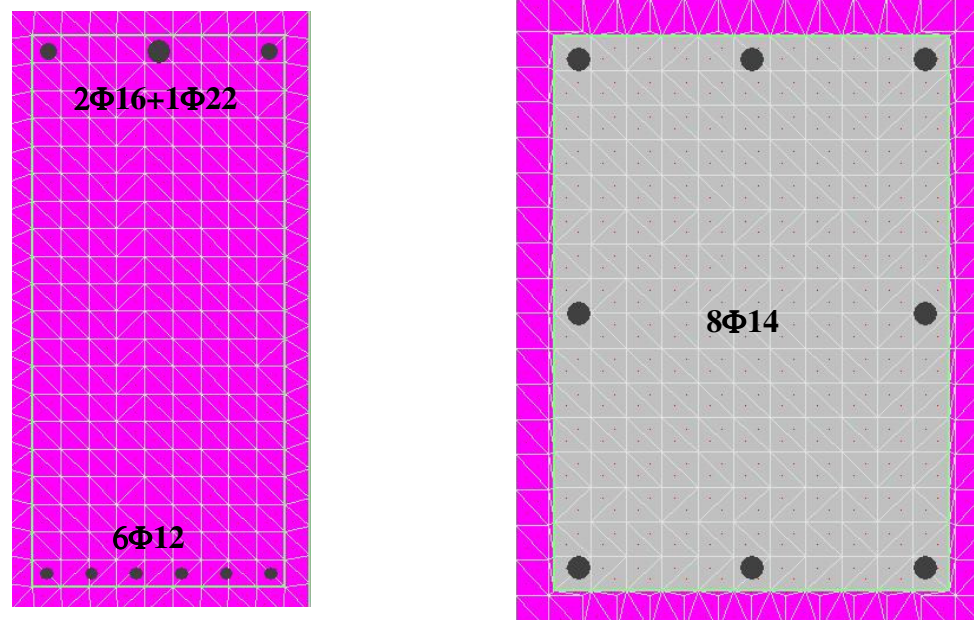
B1H1 Beam End Section and S101 Column Xtract Models
